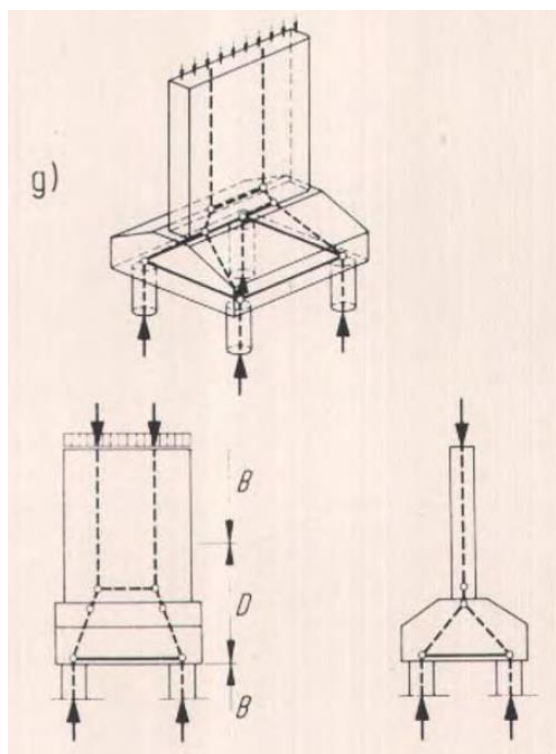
Strut-and-tie model for four-pile cap supporting the wall [5]
